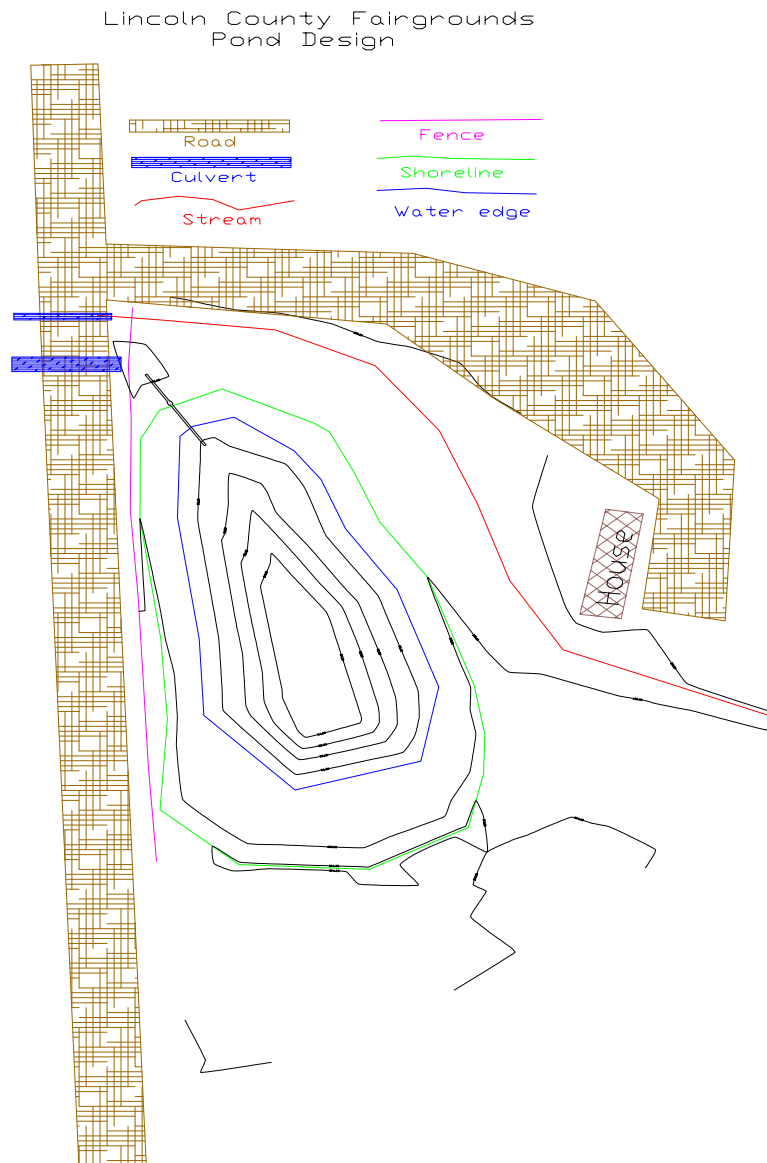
Site plan for the Lincoln County Fairgrounds pond, Eureka, Montana.
